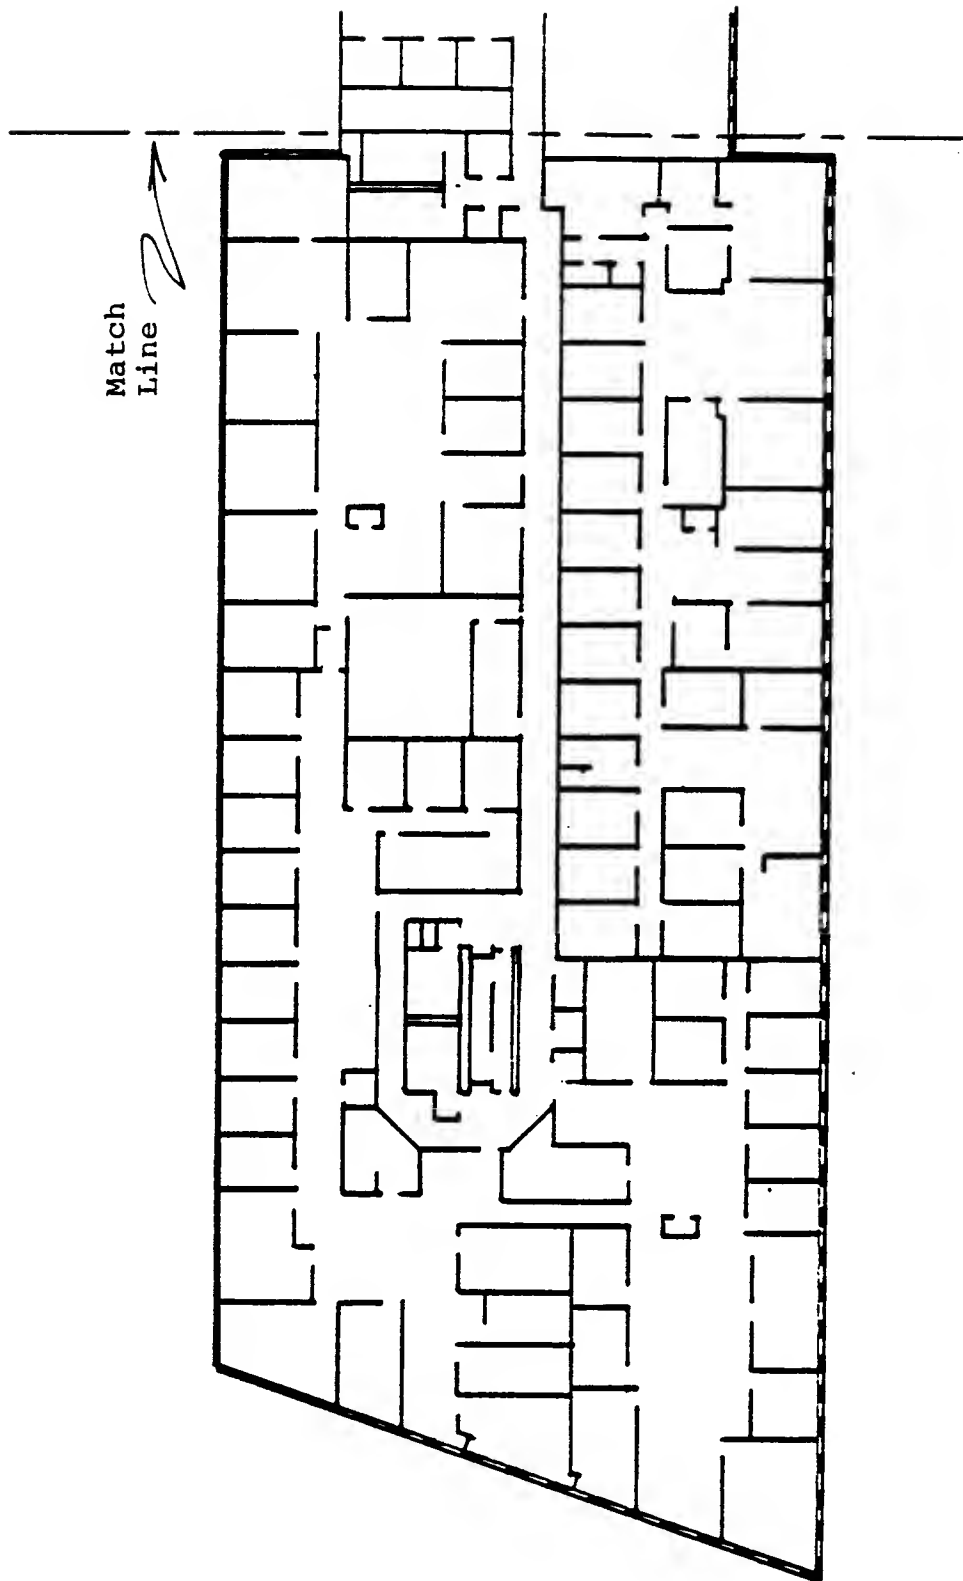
USIA BUILDING EIGHTH FLOOR-SOUTH
